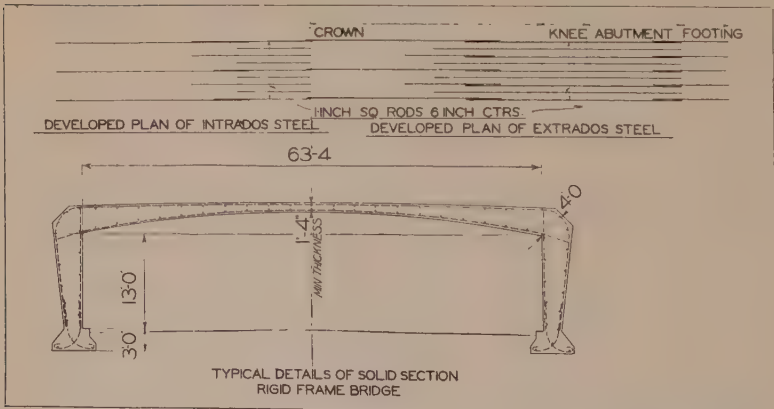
TYPICAL DETAILS OF A CONCRETE RIGID FRAME BRIDGE.
